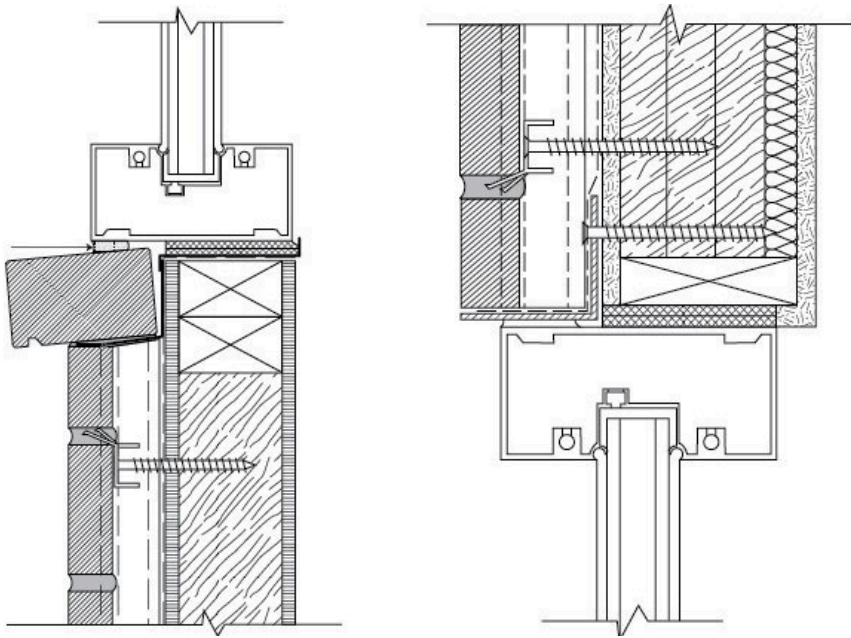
Suretouch windowsill cross-section and lintel cross-section
